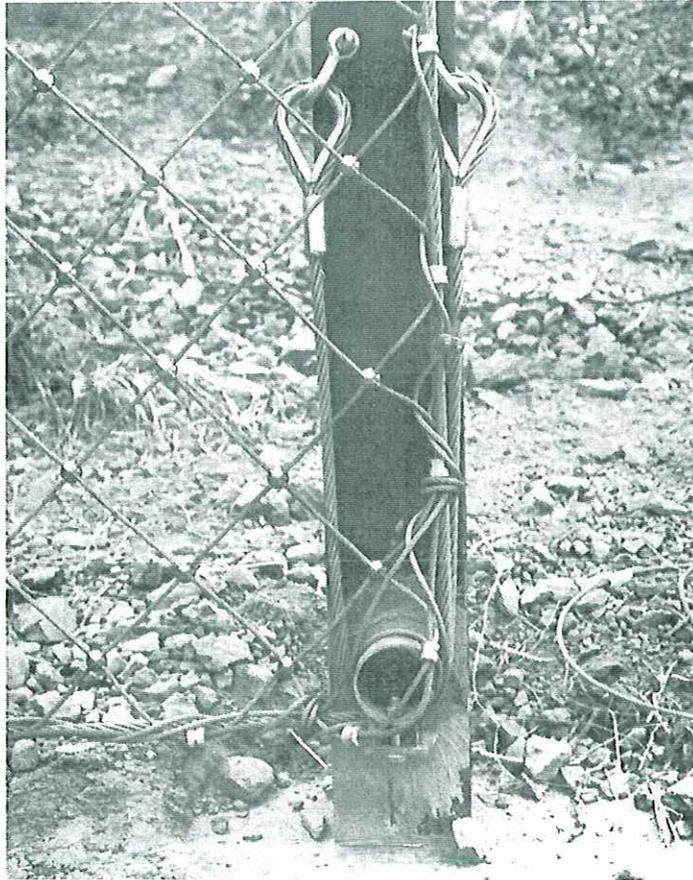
DETAIL OF BRUGG FULLY EMBEDDED POST. NOTE TRIPLE-TWISTED LACING CABLE ATTACHMENT AND SINGLE CABLE CLIP CONNECTION
